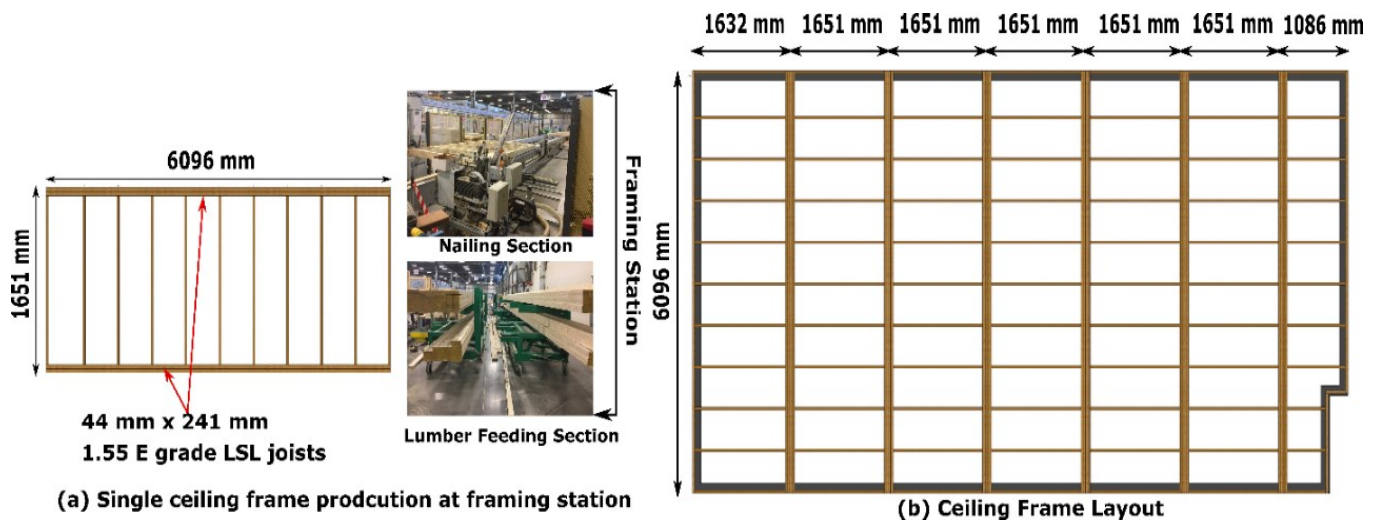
Ceiling frame layout considering fabrication option-A for the case study.
